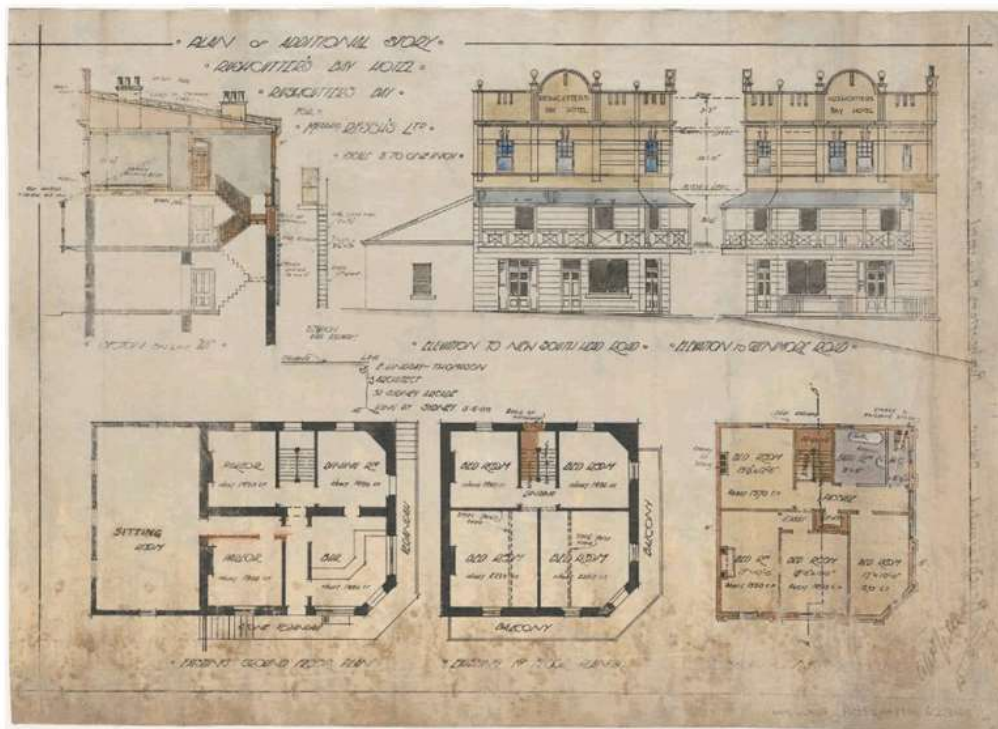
Plan of the additional storey to be added to the hotel by E Lindsay Thompson, May 1909. (Source: State Records and Archives NRS-9590-1-[Plan62948]-[342])
